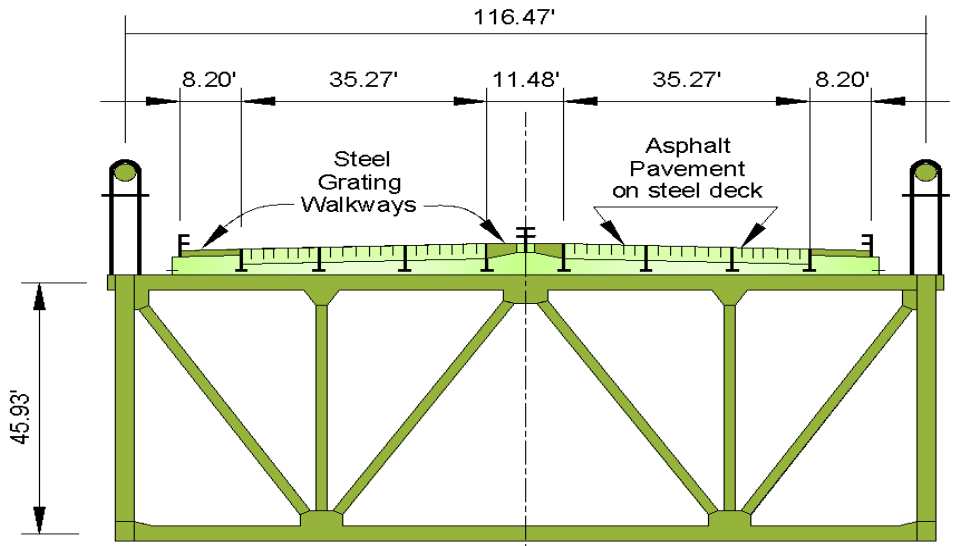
Typical section of the 100,000 short ton stiffening truss
